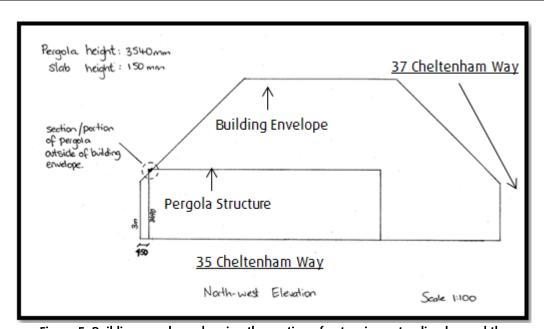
Building envelope showing the section of extension extending beyond the building envelope.
